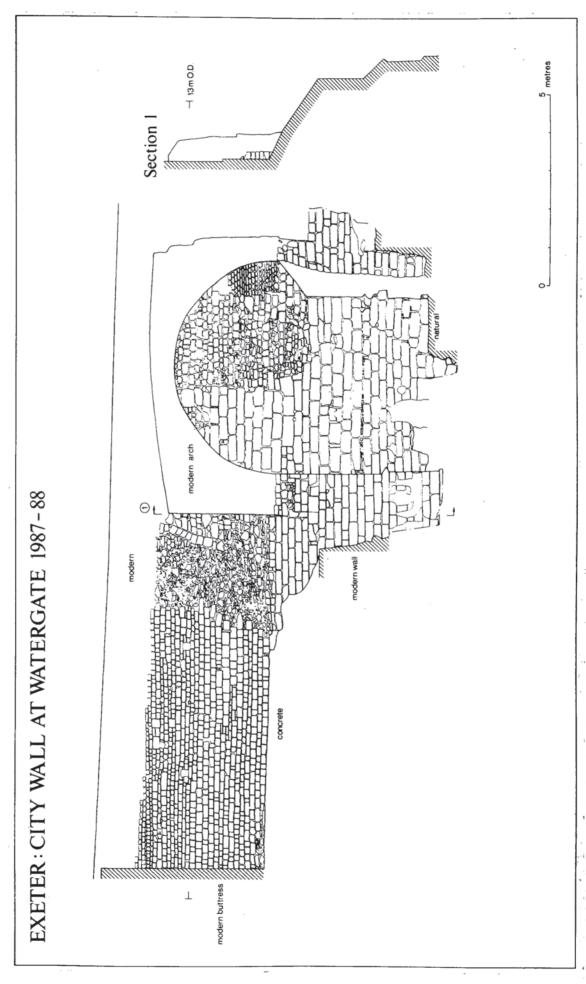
Cricklepit Street 1987, elevation of the wall below the Watergate.
